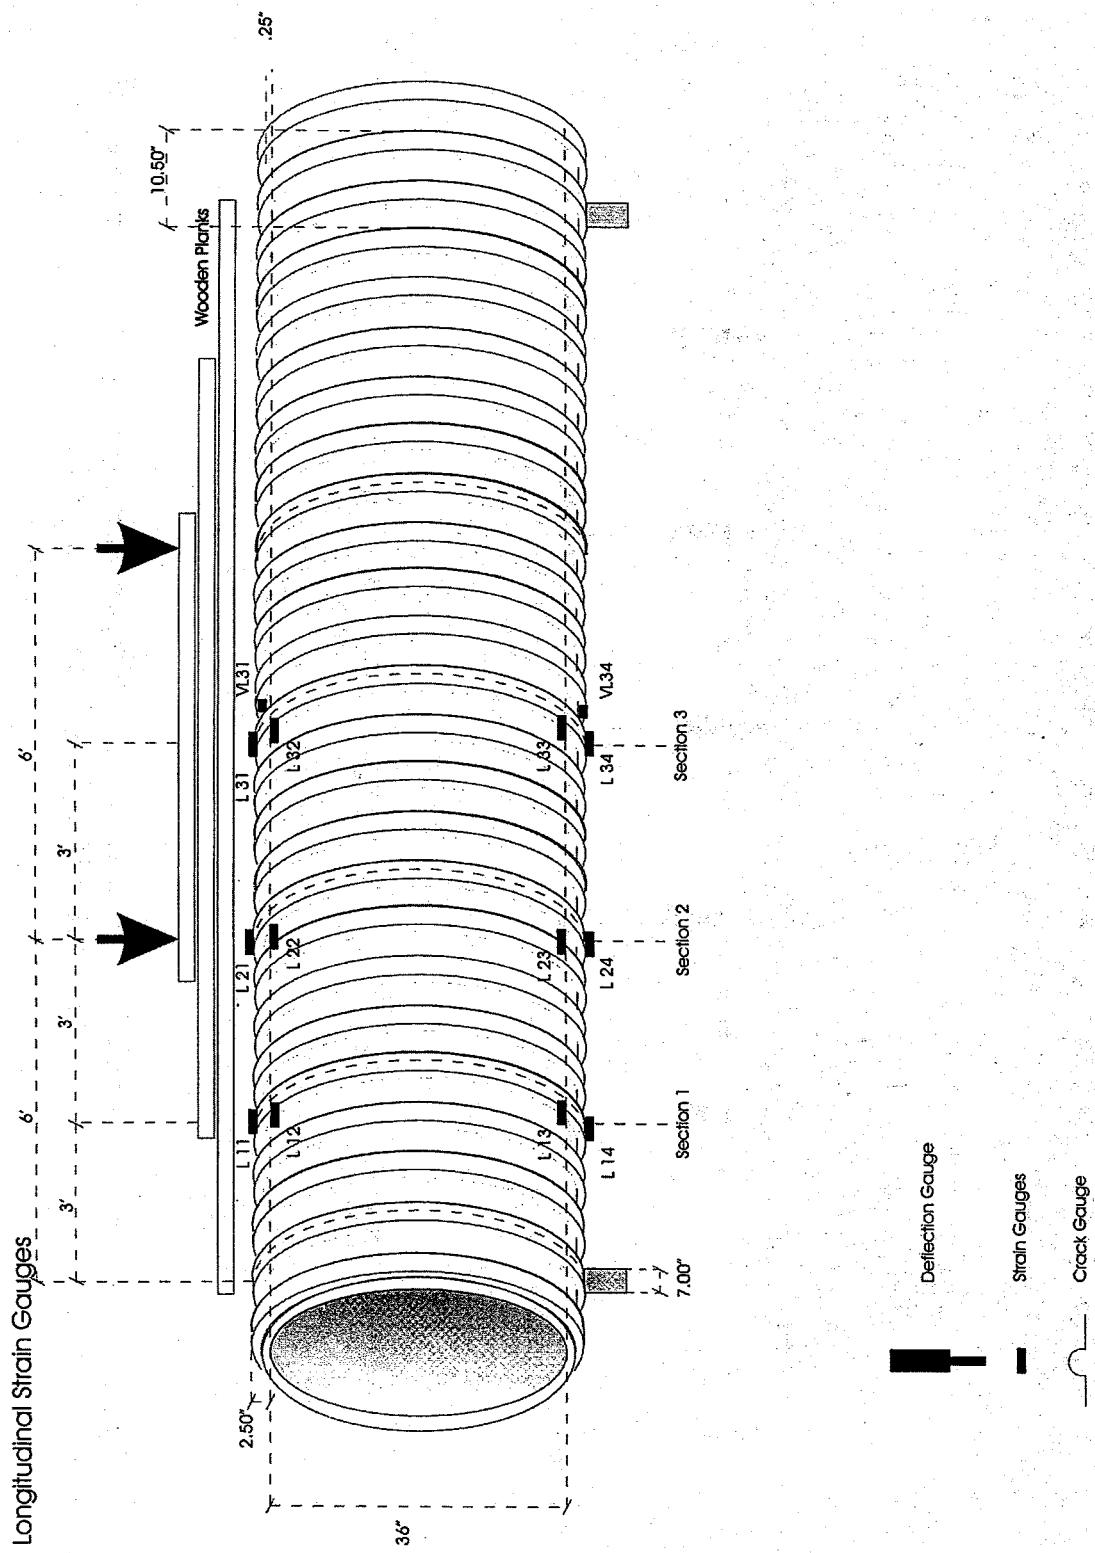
Location of Longitudinal Strain Gauges on Top and Bottom of ADS 36, Hancor 36 and PVC 36 Pipe Specimens
